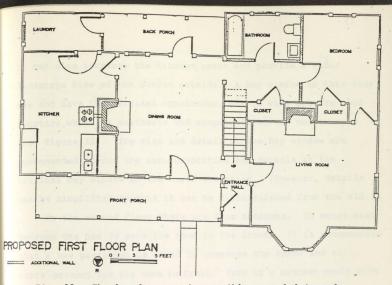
The laundry room is possibly expanded in order to provide larger space for laundry facilities.
